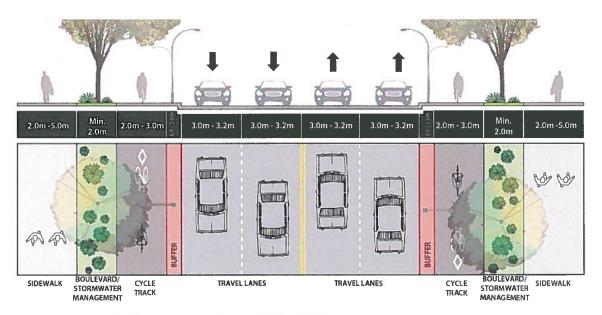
Mid-Term Shelbourne Street Right-of-Way
